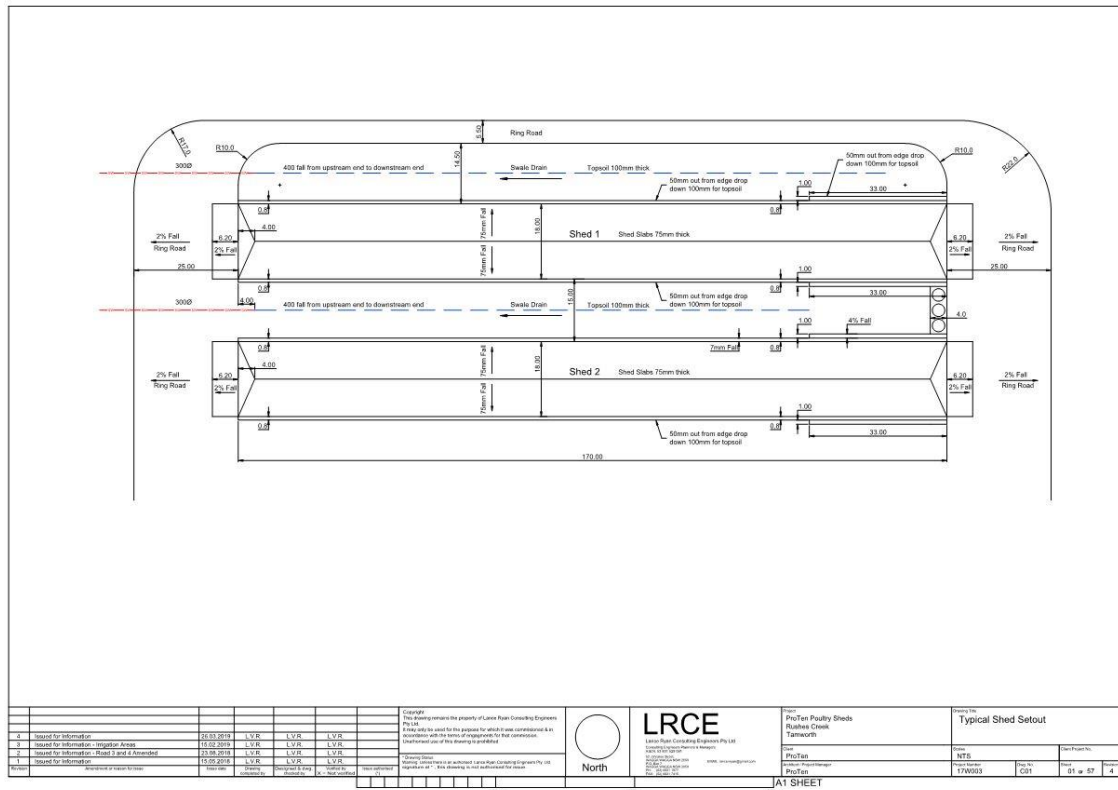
Typical shed layout (Lance Ryan Consulting Engineers Pty Ltd, 2019)
